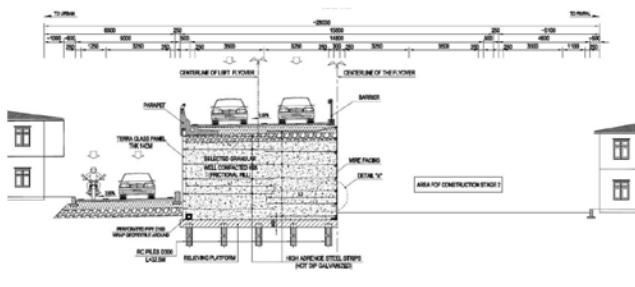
Section of stage 1 of a two-stage construction of Reinforced Earth
